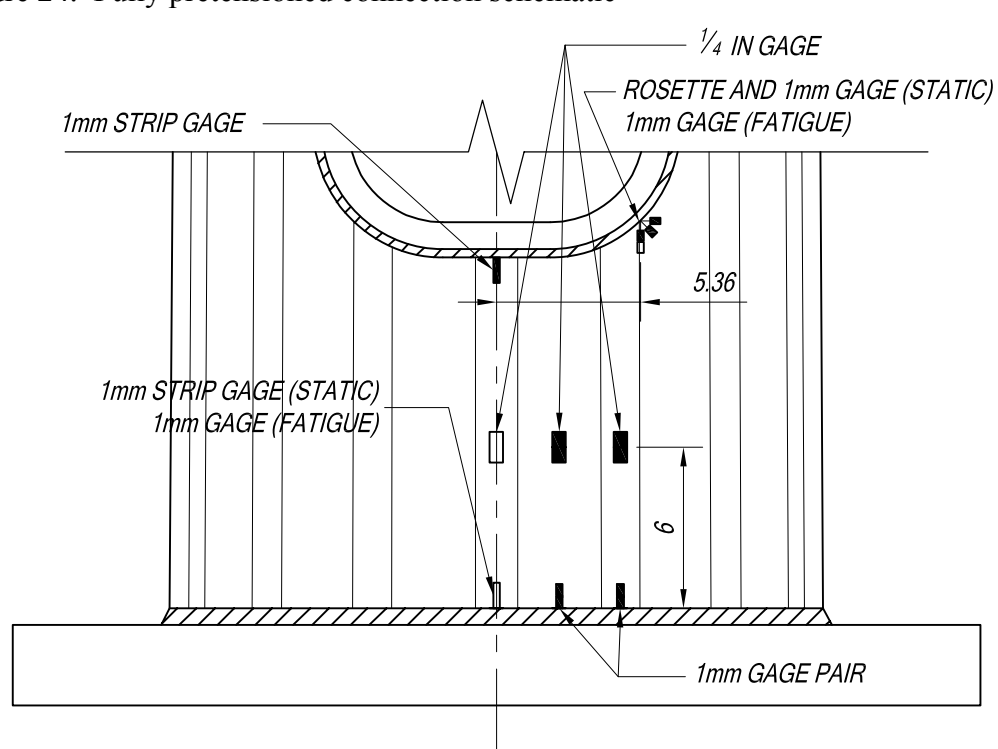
Type X specimen elaborately instrumented specimen strain gaging plan
